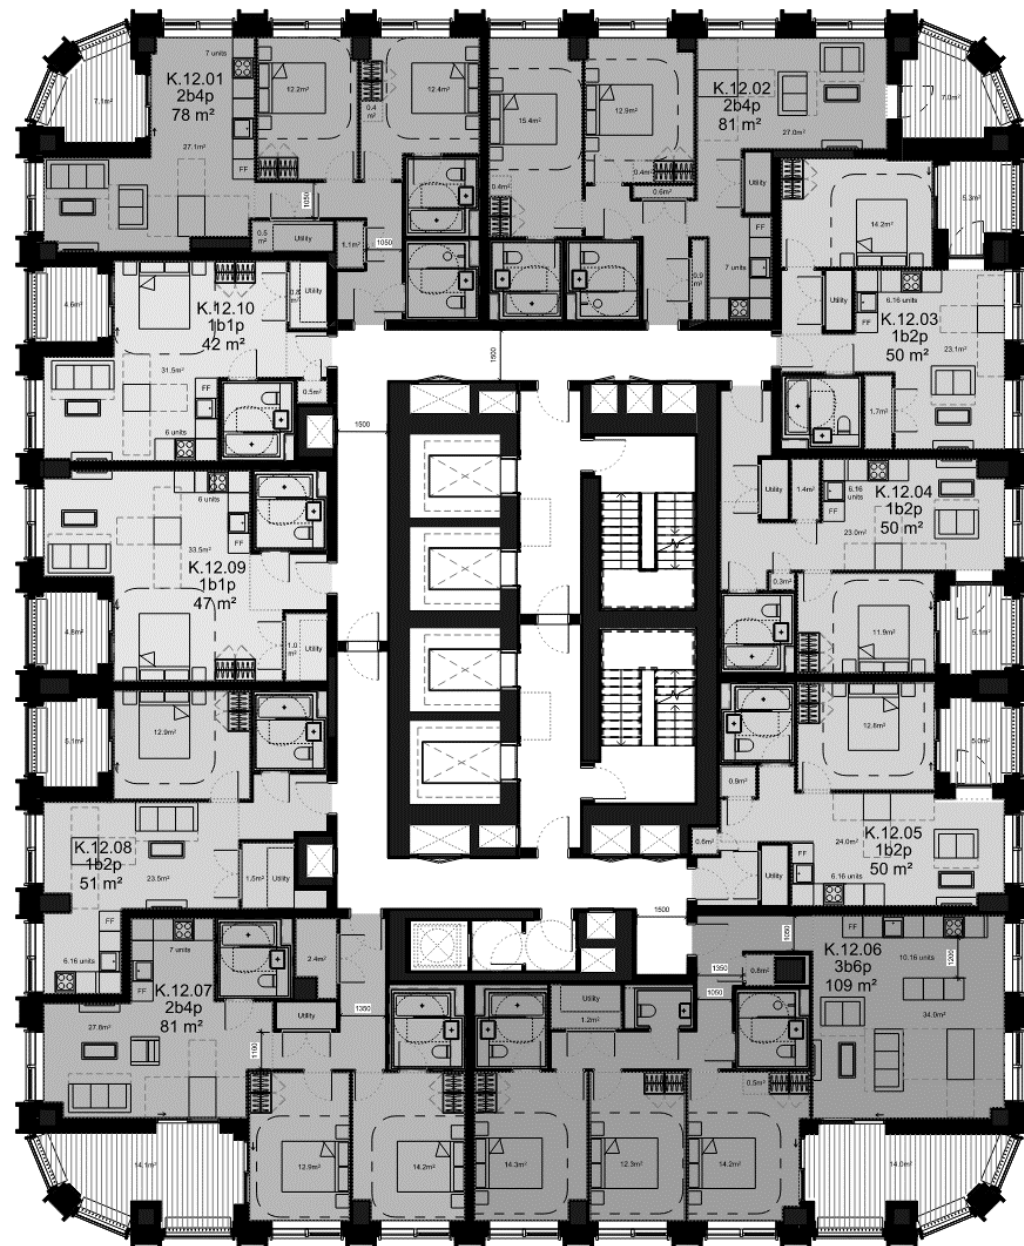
Example of Residential Apartments Floor Layout (Block K Levels 12 Layout)
